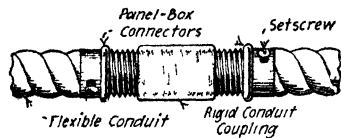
Joining two flexible-conduit ends by using two panel-box connectors and a rigid-conduit coupling.
